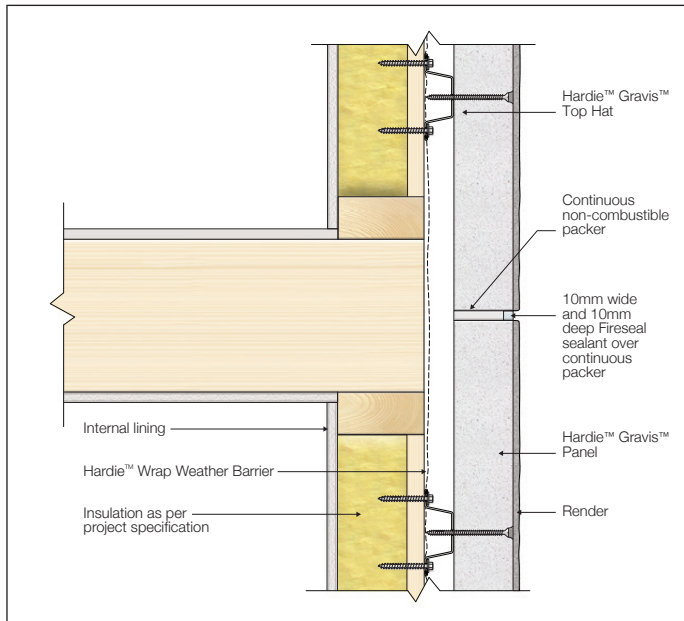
ZERO LOT WALL HORIZONTAL CONTROL JOINT DETAIL
